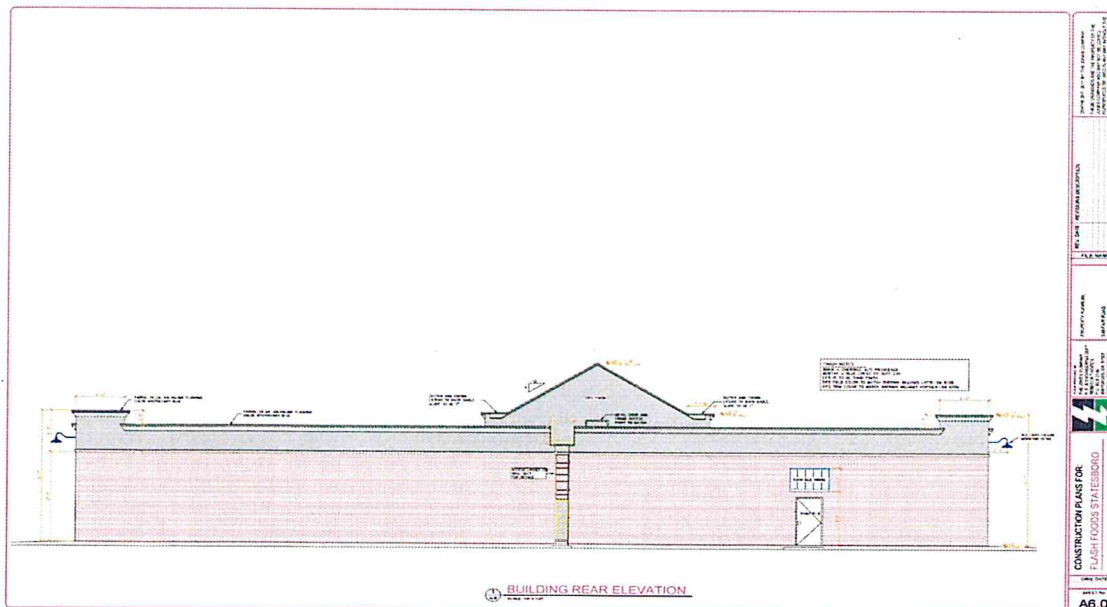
## EXHIBIT C: PROPOSED NEW PROTOTYPE
